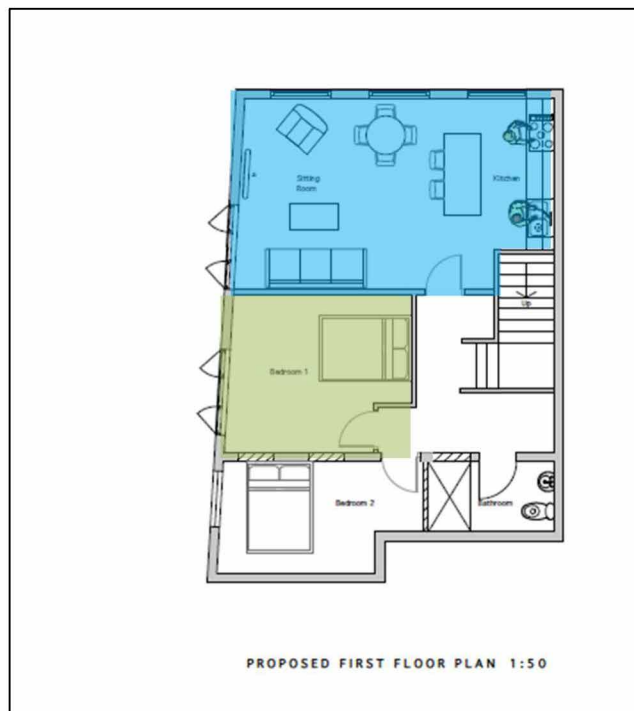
First floor assessed living room shaded blue, assessed bedroom 1 shaded green.
